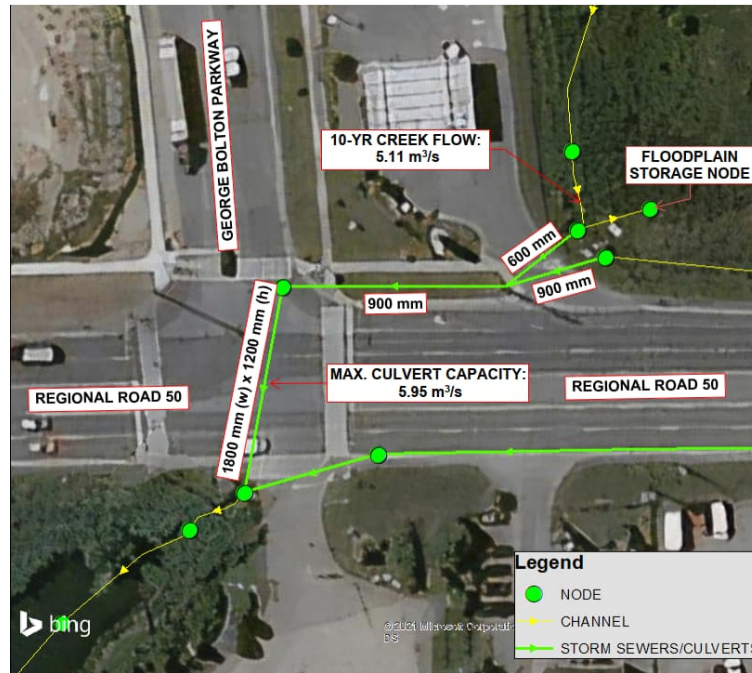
2. : Existing Drainage Configuration at George Bolton Parkway
